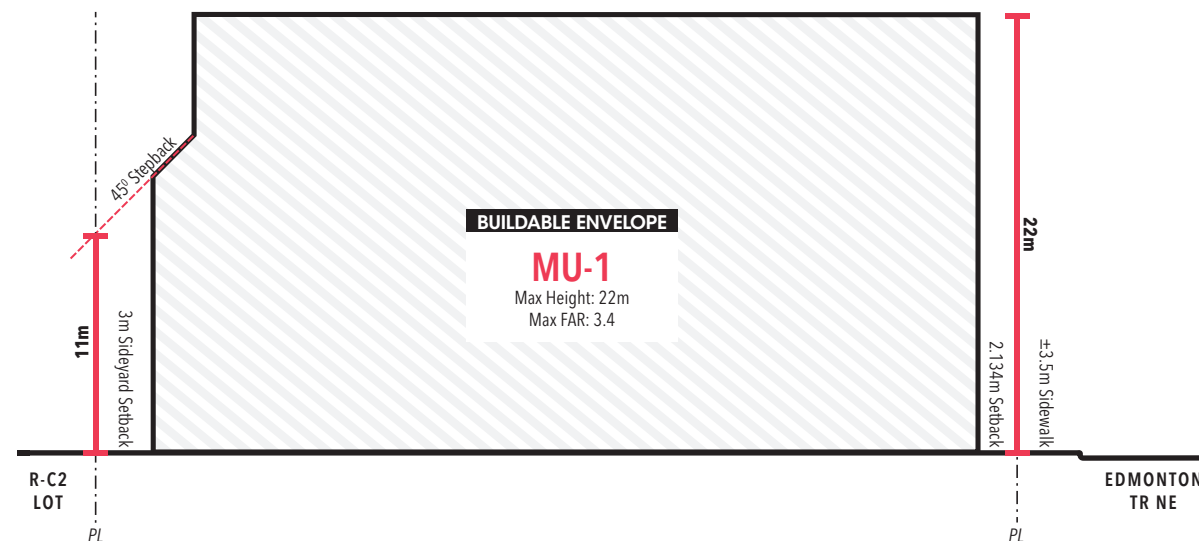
PROPOSED BUILDING HEIGHT MODIFIER
